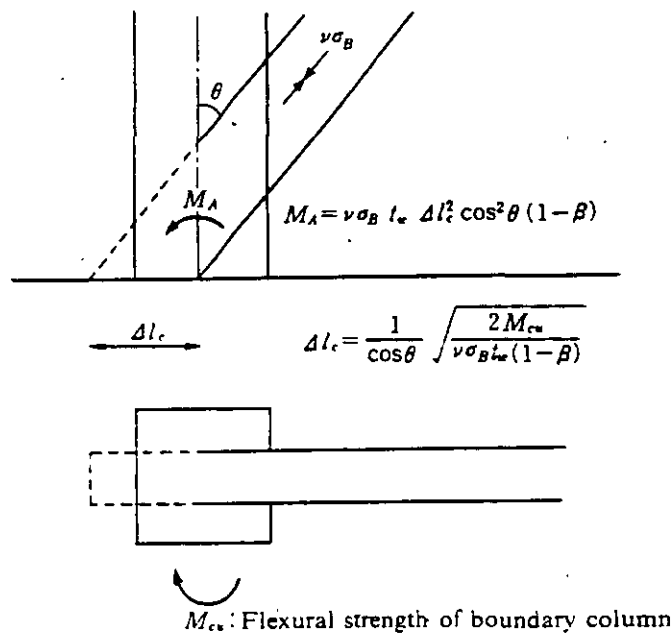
Increment of the wall width due to confinement of a boundary column.
